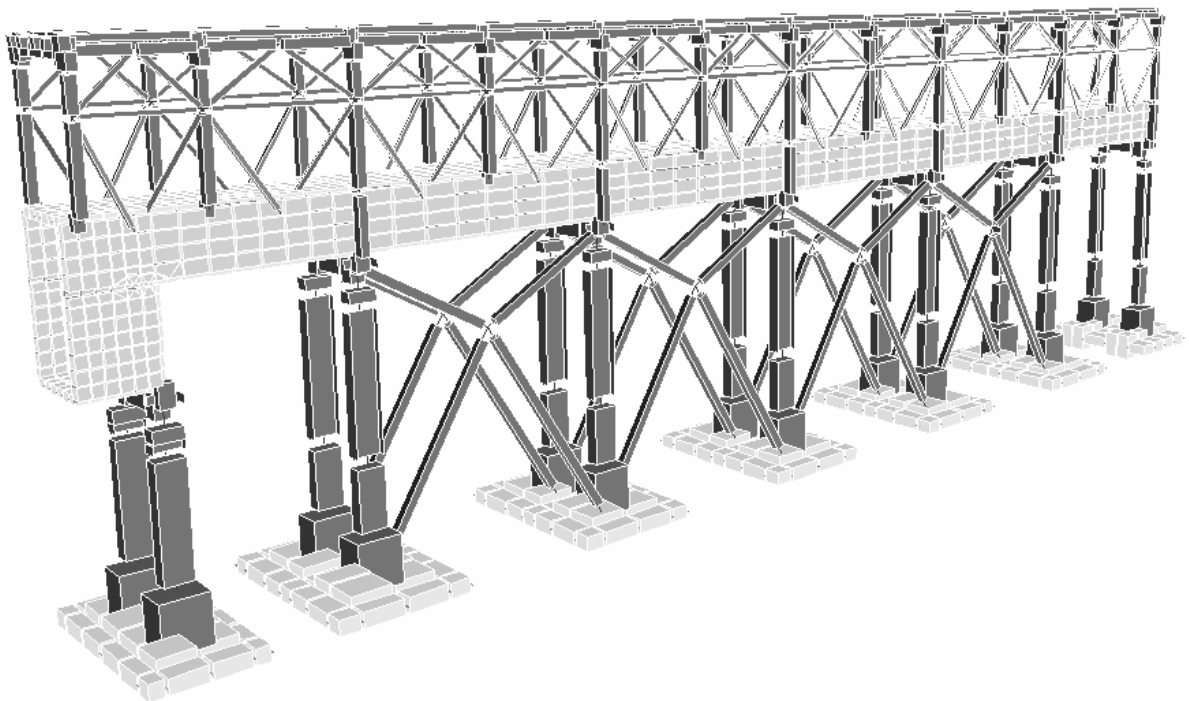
Portal type vertical steel braces arranged in all spans in longitudinal direction
